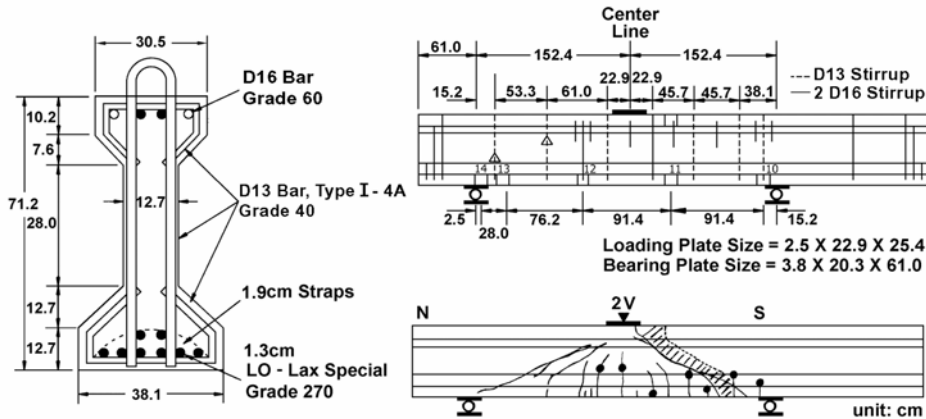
Test specimen of pre-tensioned concrete beam (Adapted from Ref. [7])
